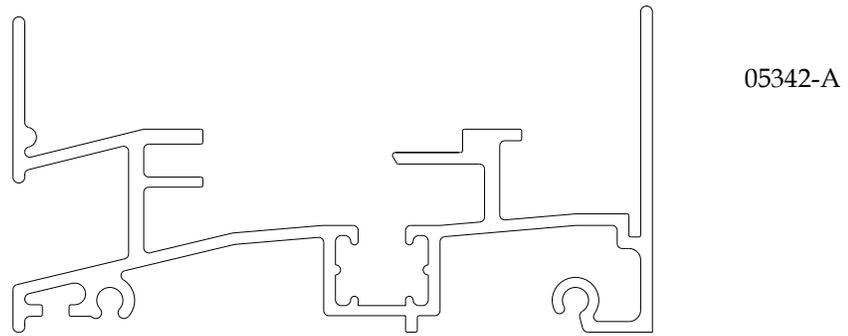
Sill Drawing for Horizontal Aluminum Slider.
